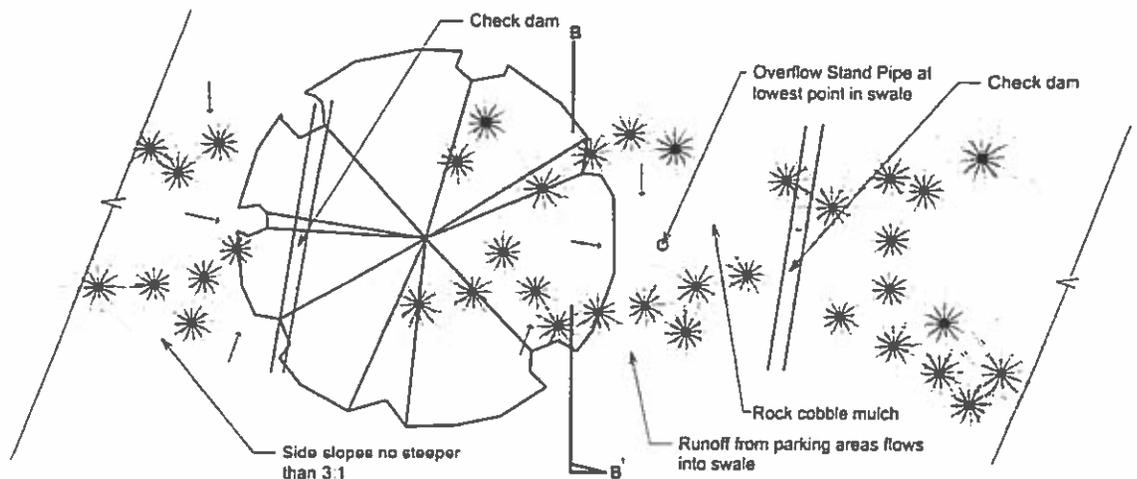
VEGETATED SWALE PLAN (EXAMPLE)
